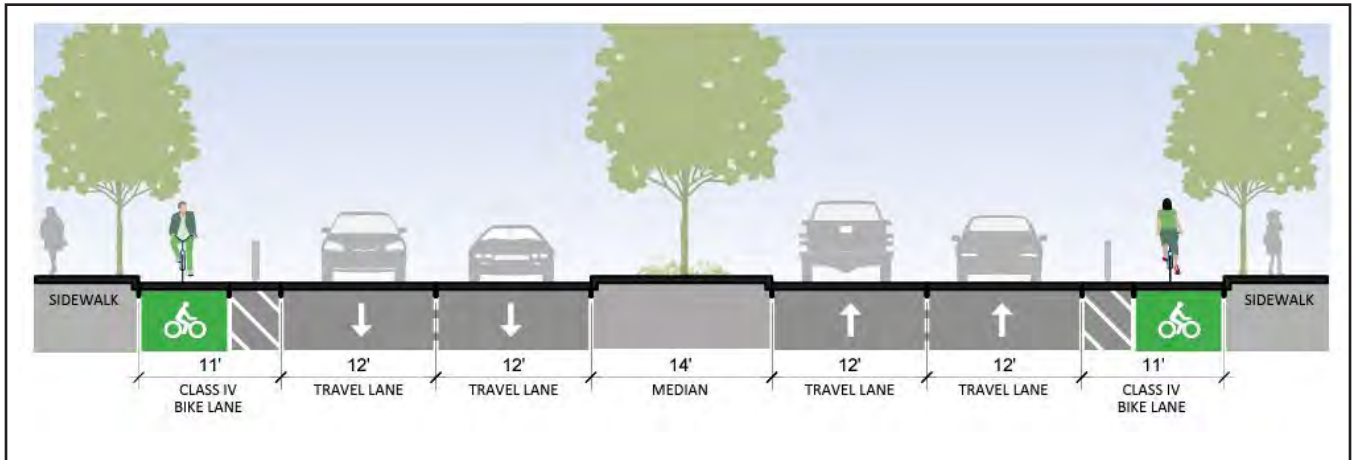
Pioneer Boulevard Cross-Section from 180th Street to 500' of 183rd Street
